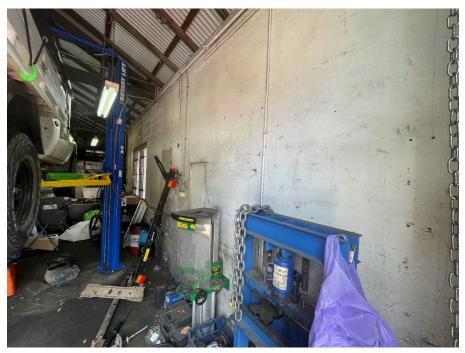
Plastered and painted south wall, January 2024. (Source: Author)
